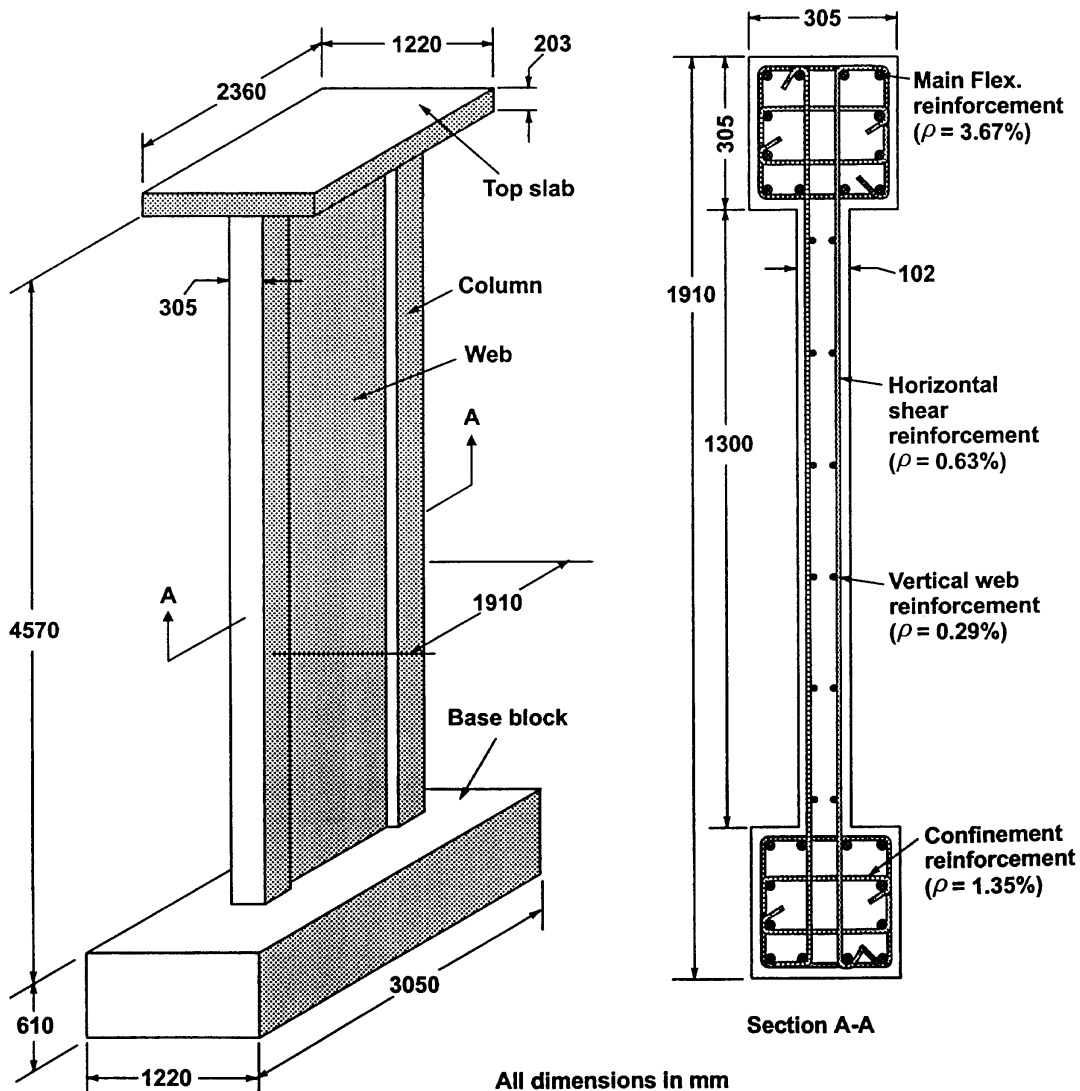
Details of Shear Wall B5 Tested by Florato et al. (1983): (a) Overall Dimensions; (b) Cross Section Details
